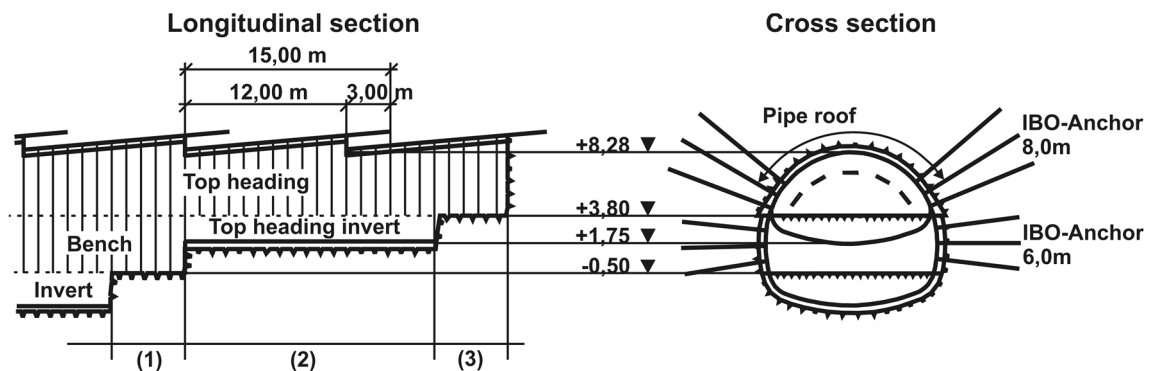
This figure shows on the left side the longitudinal section and on the right side the cross section of the excavation steps. *1 The maximum distance between the top heading face and the temporary top heading invert closure was 5 m.*2 The maximum distance between the face of the bench and the invert closure was 6 m.
